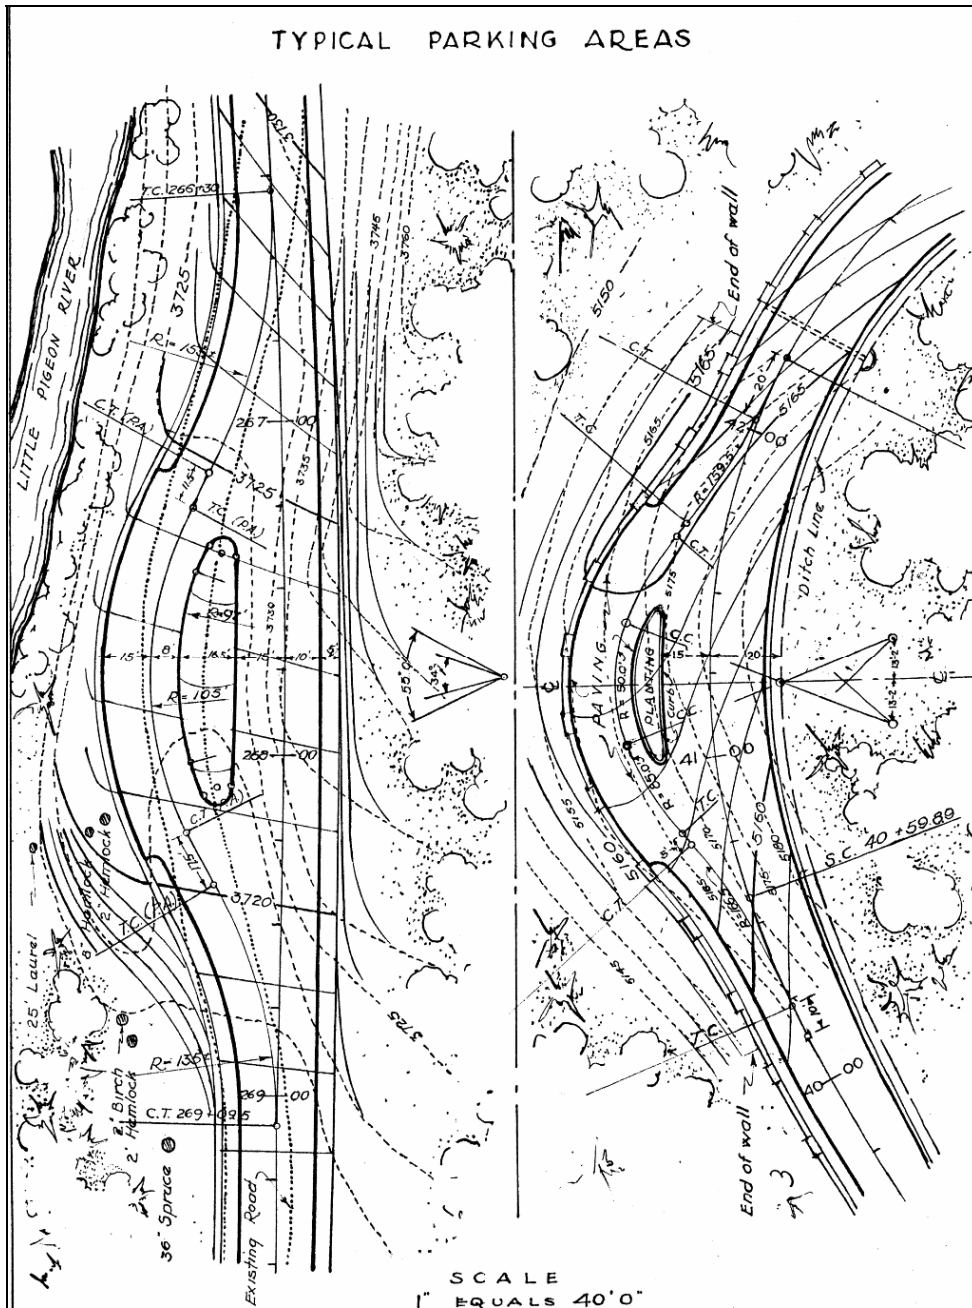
"Typical Parking Areas," (General Construction Notes, 1935).
